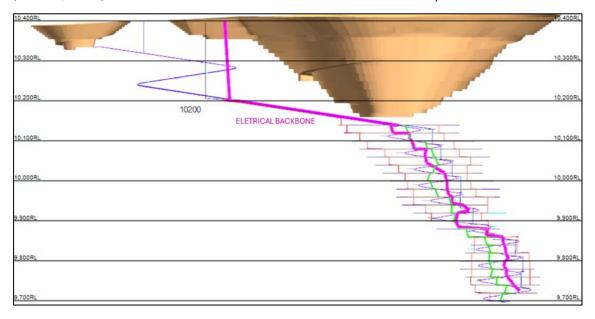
Underground Power Reticulation Backbone - Cross Section View
